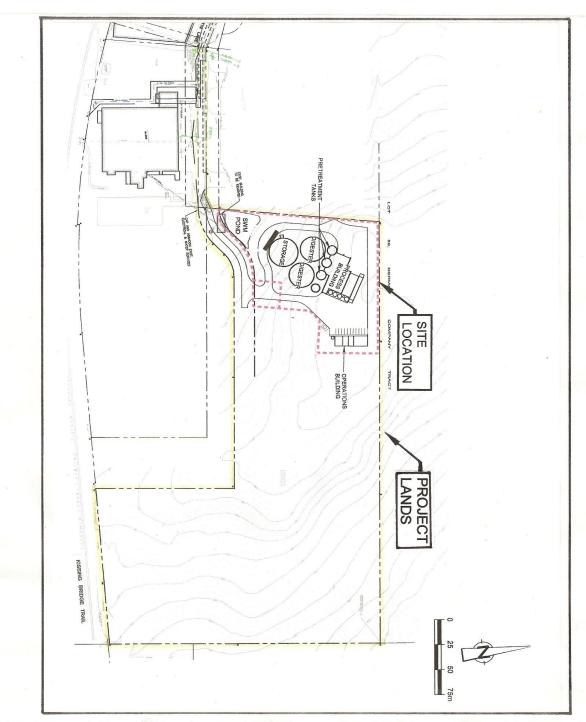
Site Plan of Proposed Bio-en Inc. Development
